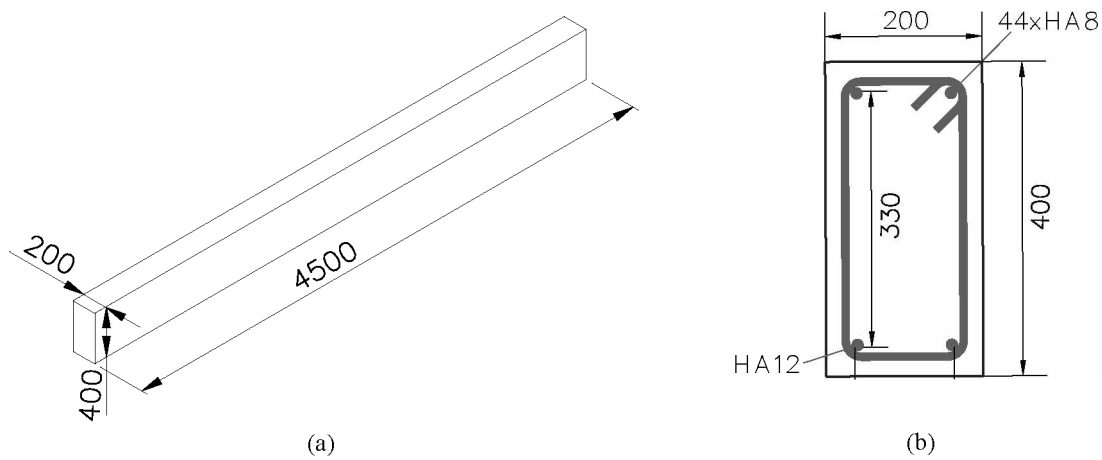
Specimen's design: (a) Geometry, (b) Reinforcement details. - dimensions in millimeters -
